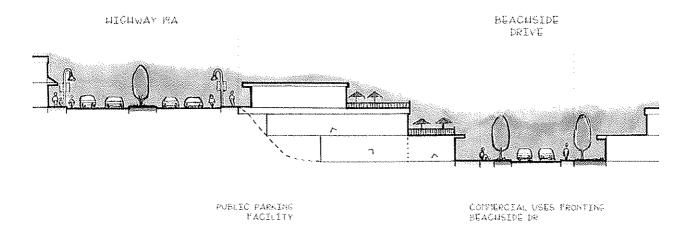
Cross section showing the grade differential Highway 19A and Beachside Drive and potential building forms
